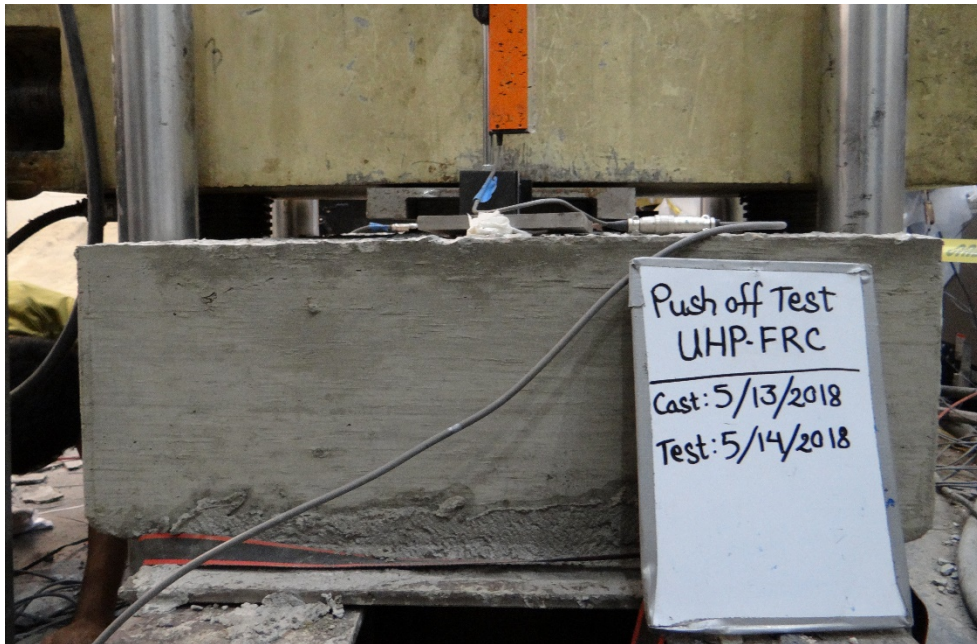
Punch test setup for specimen with UHP-FRC precast slab and cast-in-place joint.
